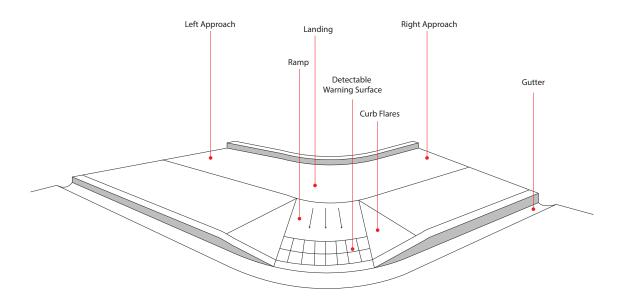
Components of a Curb Ramp. Source: CUUATS Sidewalk Network Inventory
